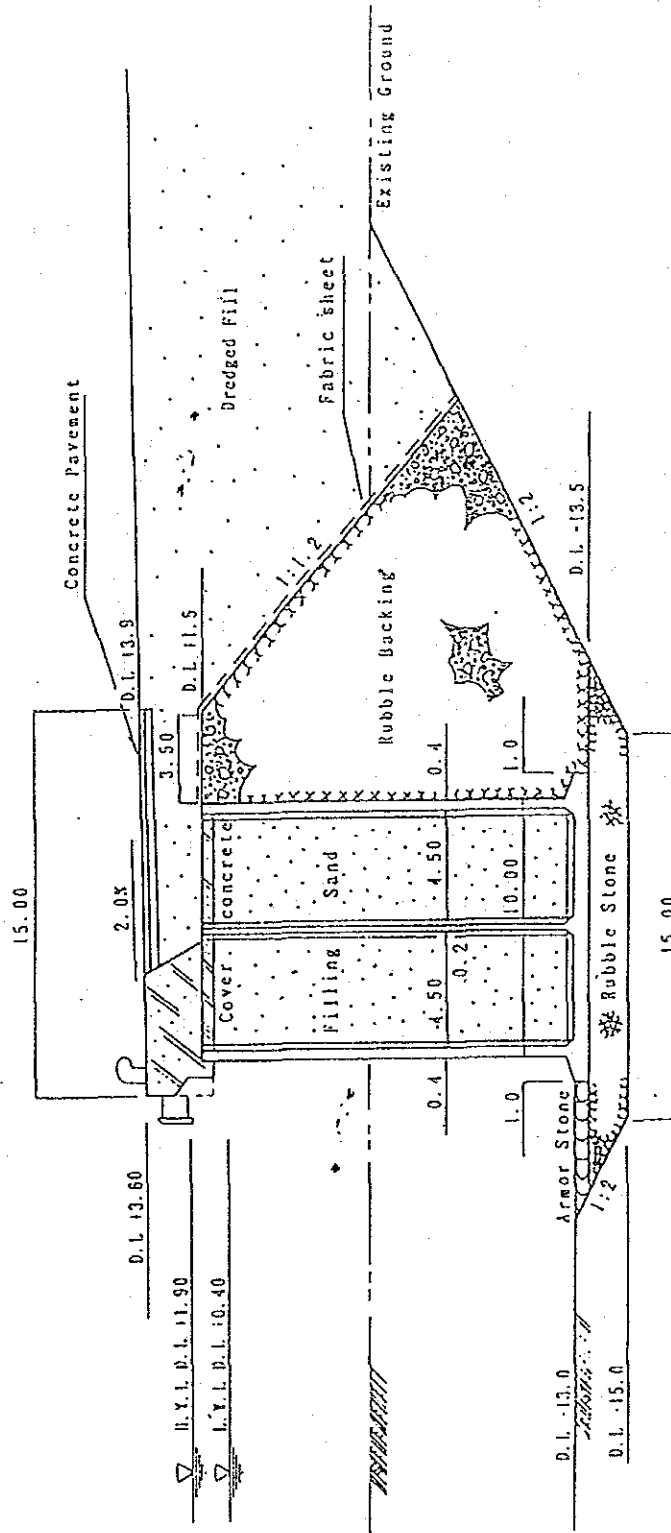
Gravity Type of Concrete Caisson for Bulk Cargo Quaywall
